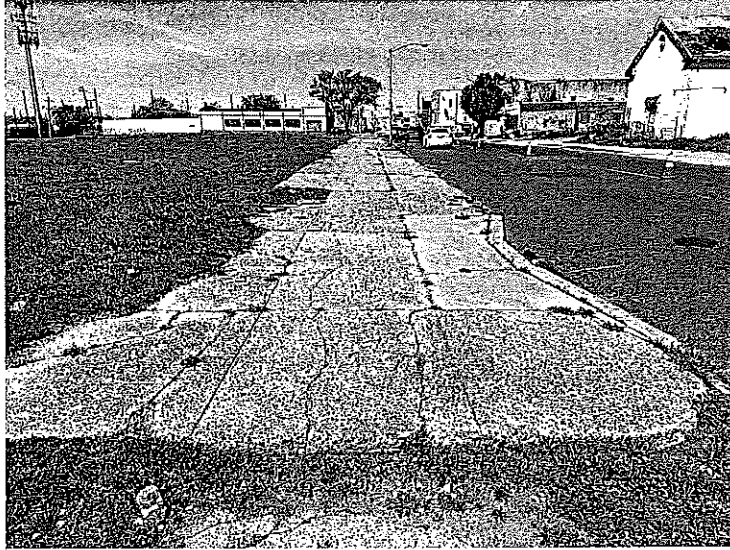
Sidewalk along Kaighns Avenue with unobstructed access to site.
